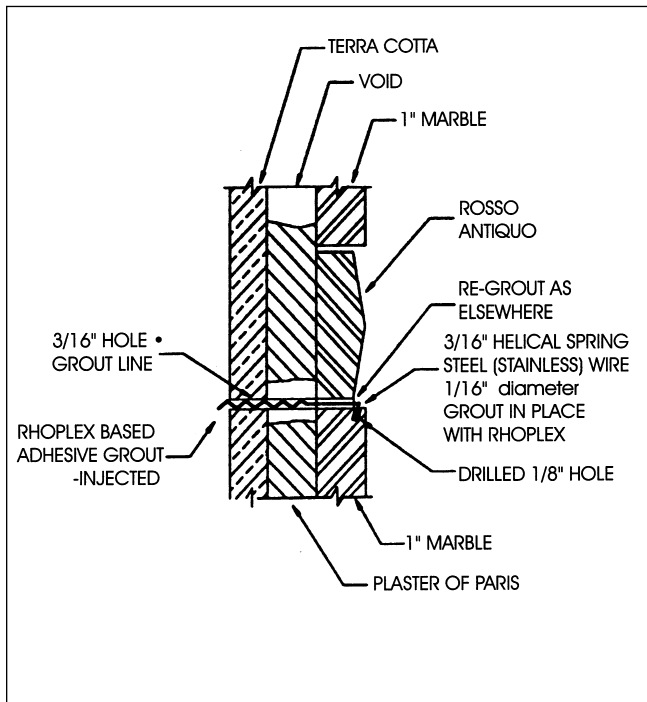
Cross section of marble cladding and wall showing mechanical connection.
